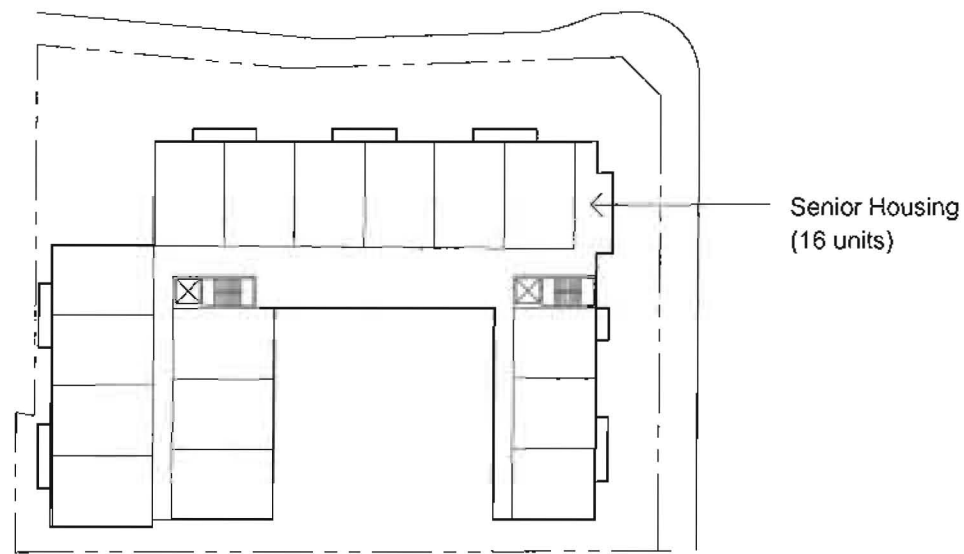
Development Concept Plan □ 1st/ Boyle □ Site No. 2
